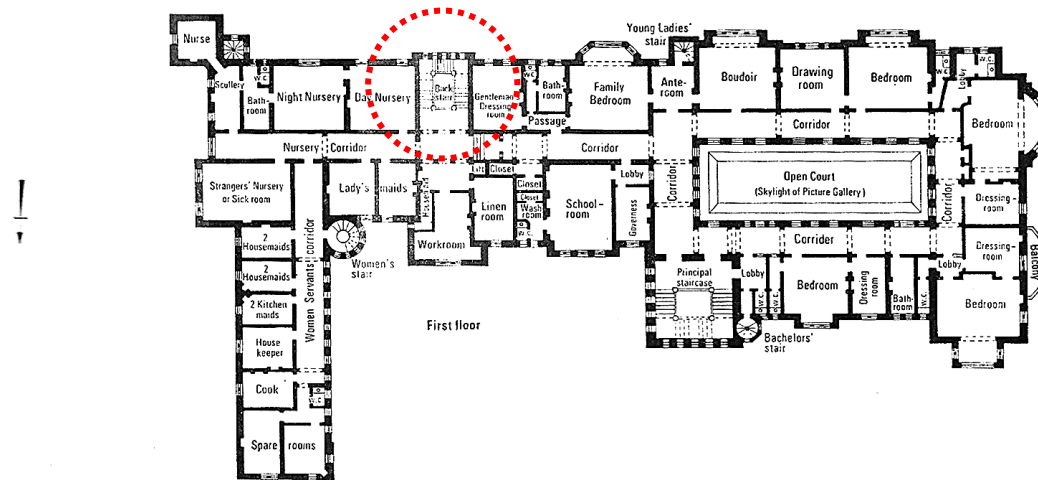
First Floor – Historic plan. 'Back Staircase' marked in red.
